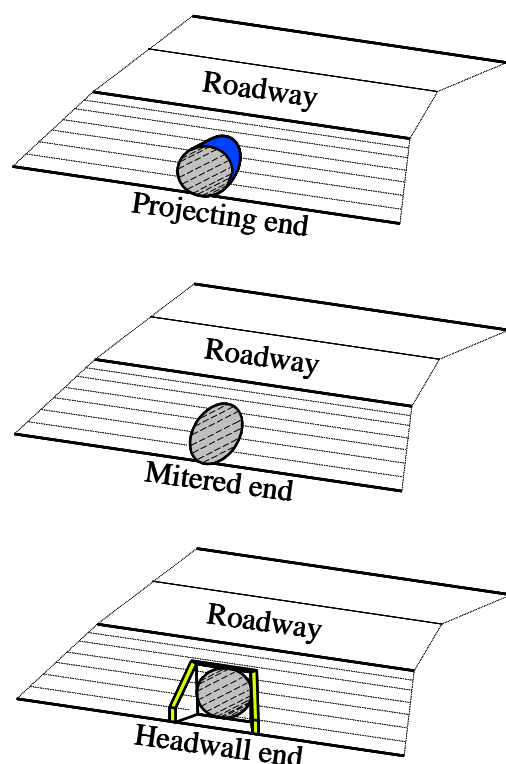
Inlet (outlet) designs (projecting, mitered, and headwall)
